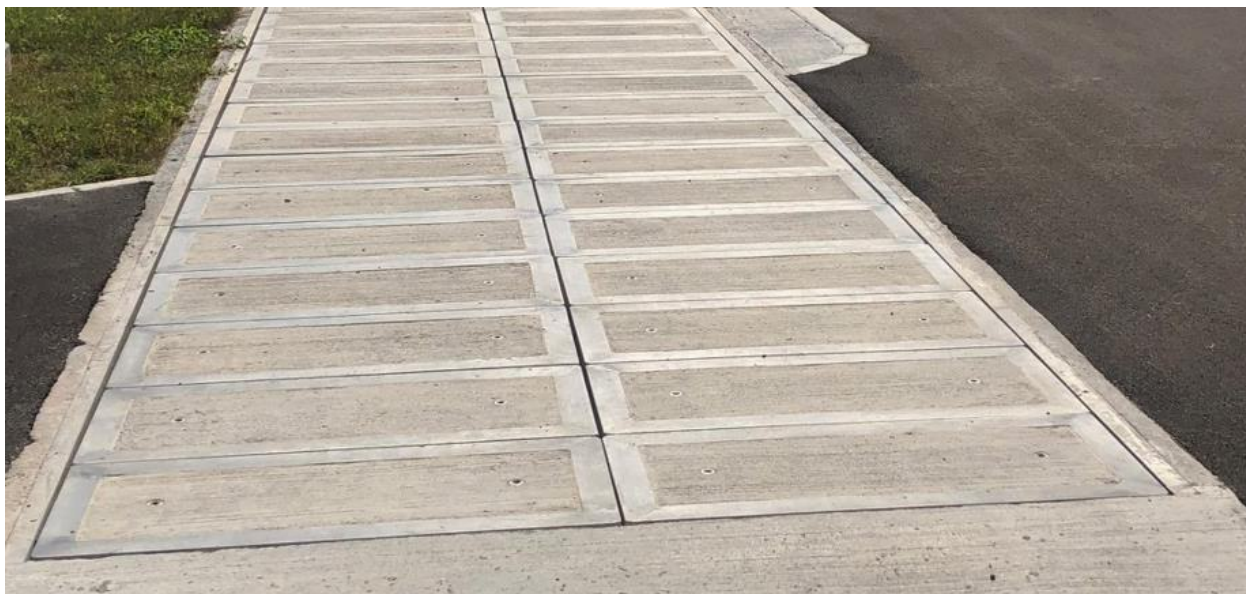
Reinforced concrete channels with heavy-duty concrete covers (designed for traffic loads equivalent to class D400 according to SIST EN 124-2)
